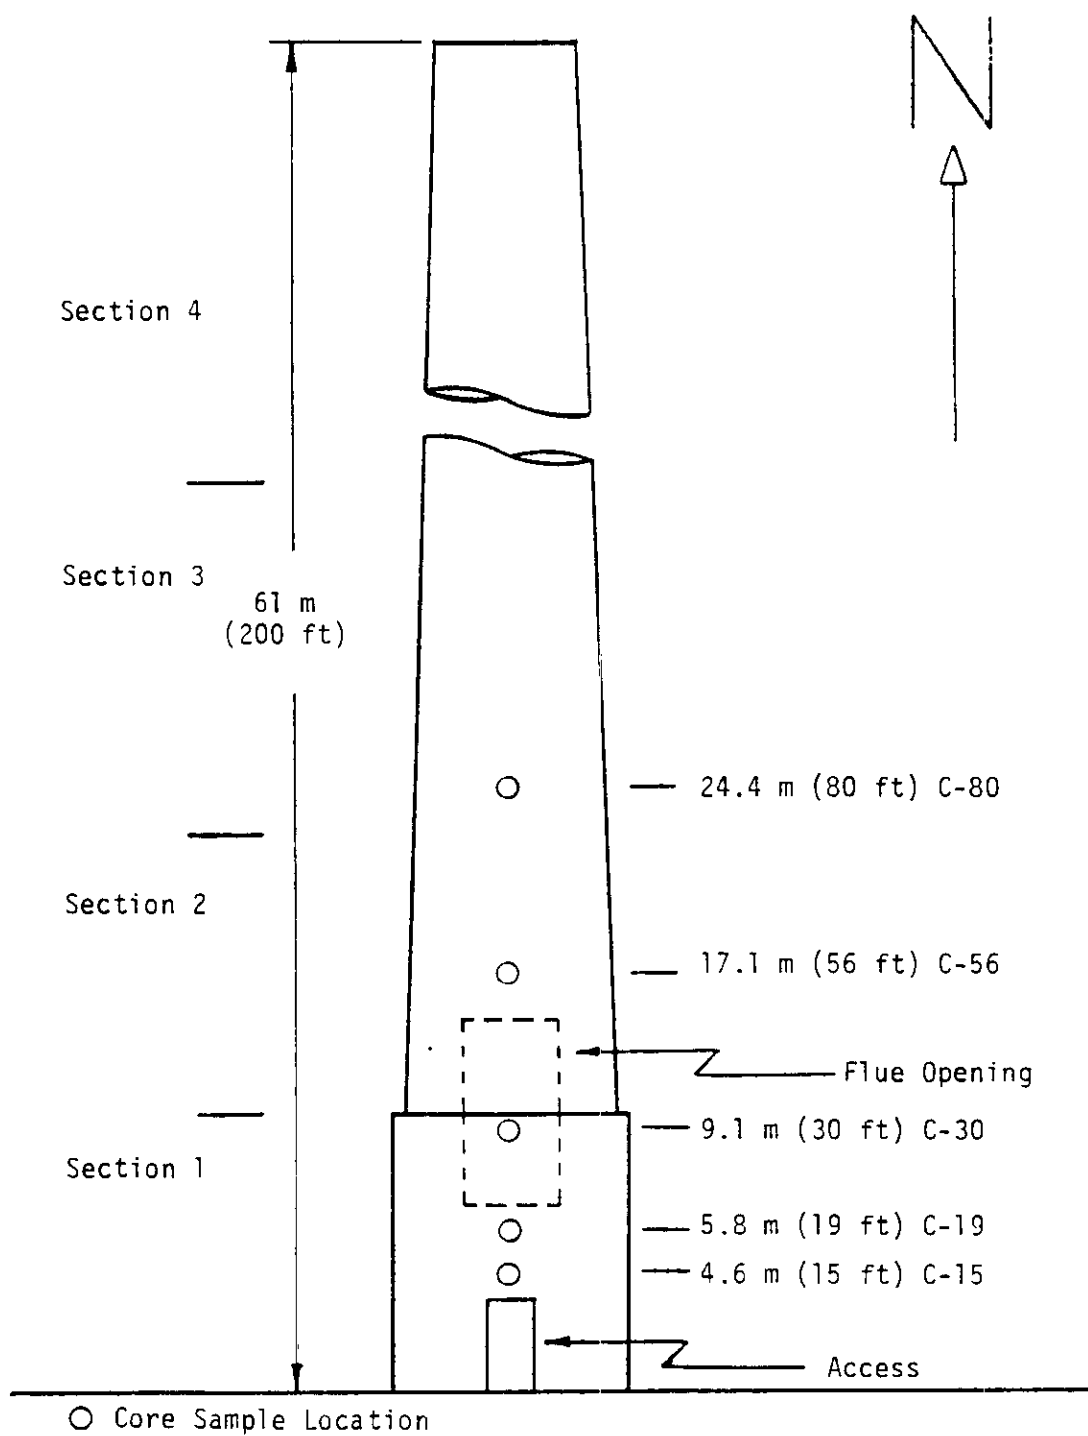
North Elevation of 116-H Stack Showing Locations of Core Samples
